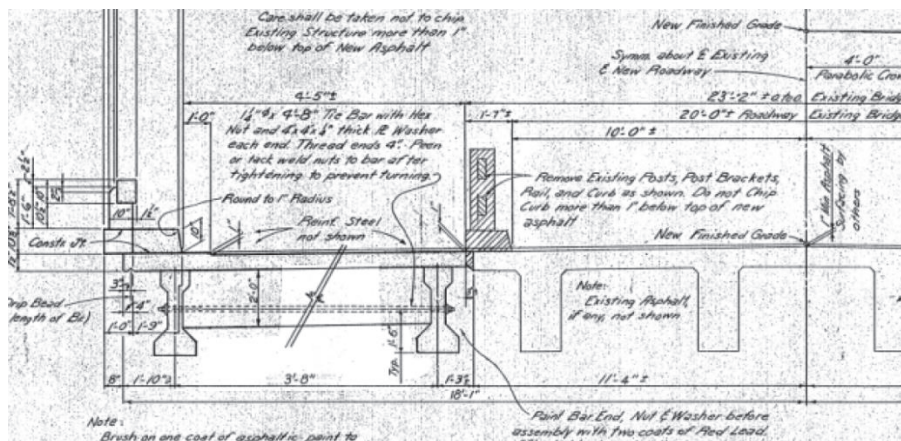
RC Tee-Beam Bridge with AASHTO Girder Widening
